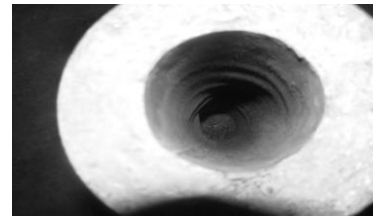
Failure pattern of inner tube – Top view of DSCFT specimen.
